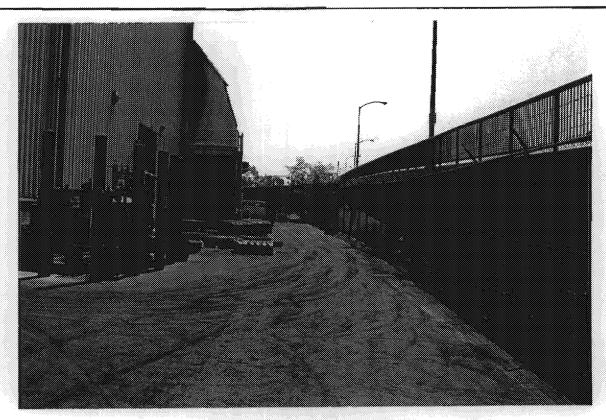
South Side of Forge Building at 5321 Firestone Blvd.
